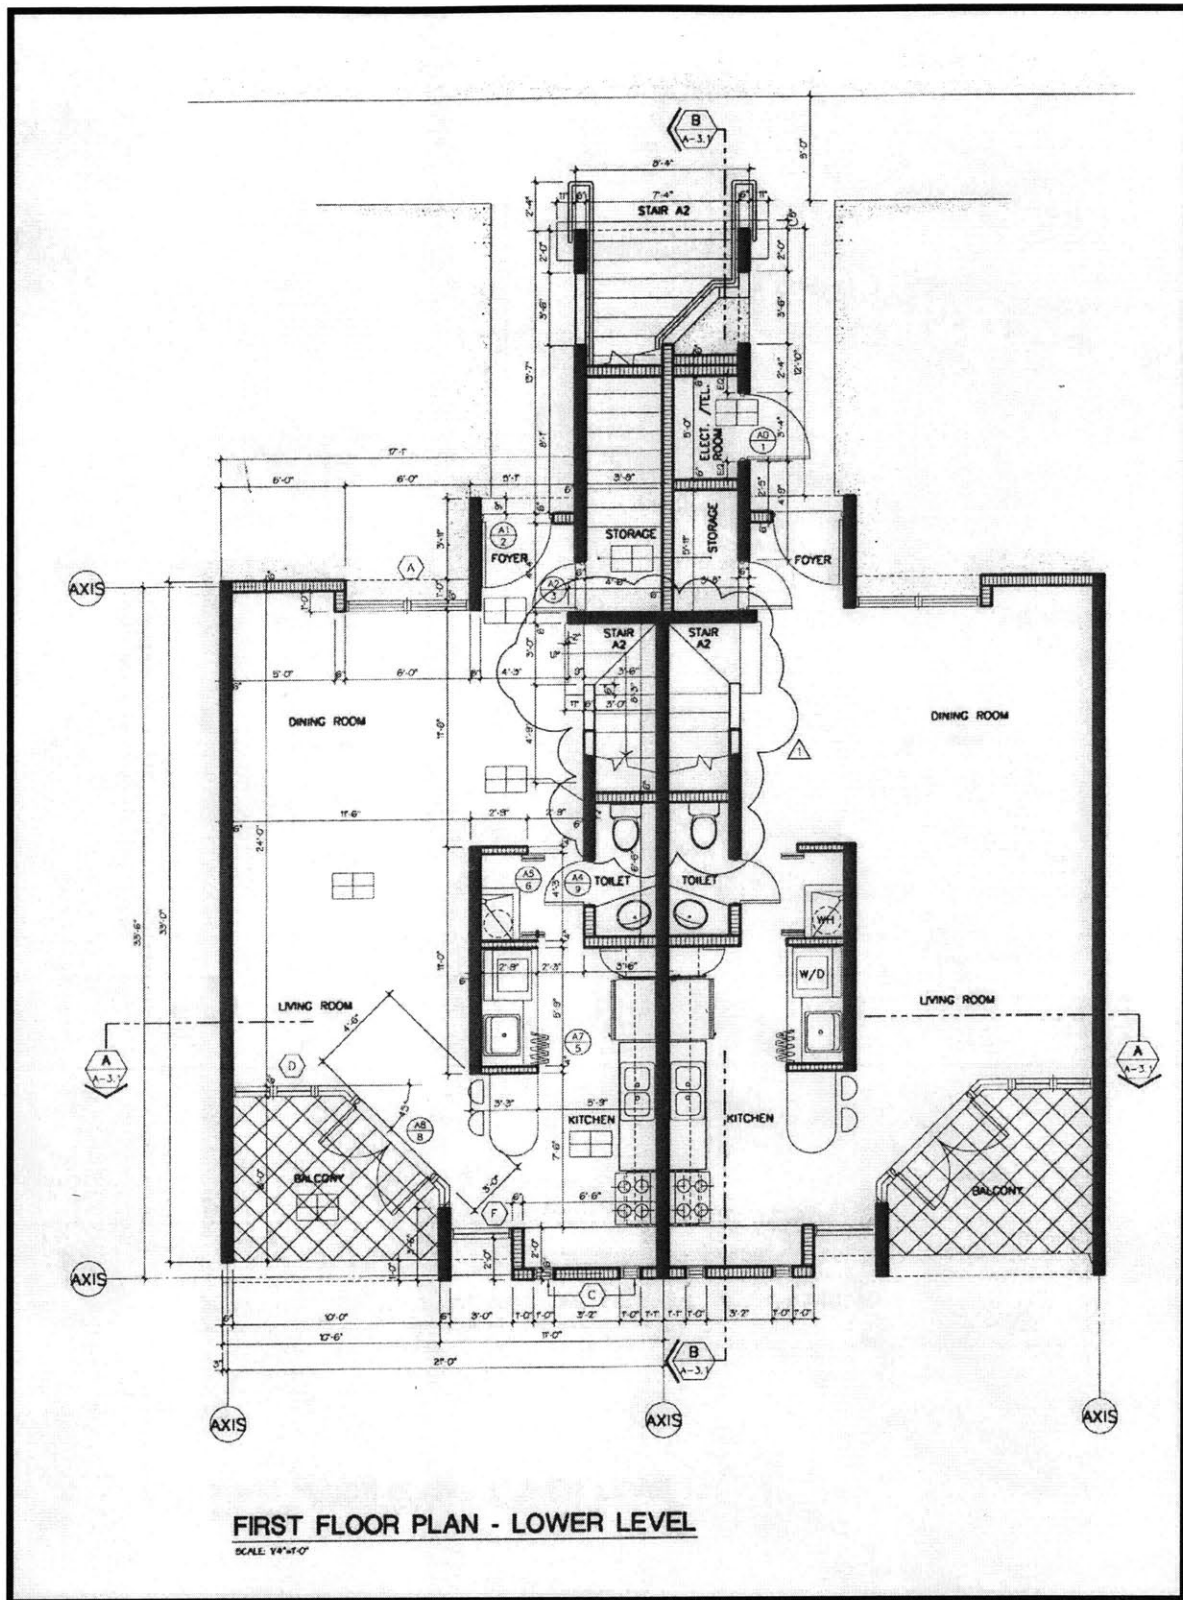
First floor plan for two units with a second floor above. These units are similar to a townhouse. (Used with Permission: Sierra, Cardona, Ferrer)
